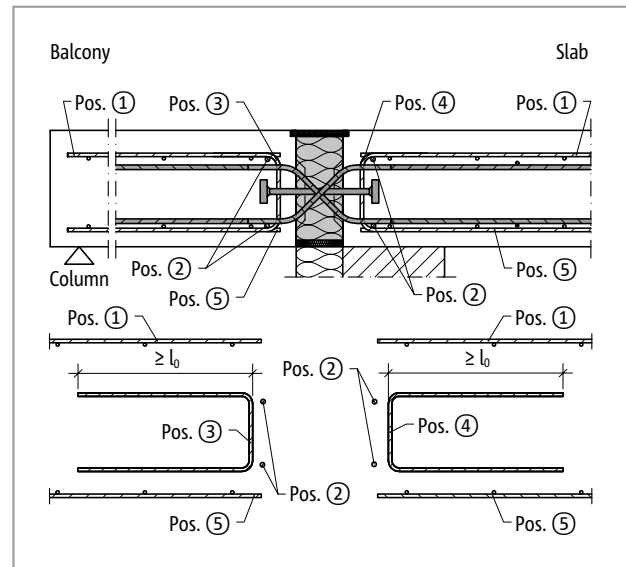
Schöck Isokorb® T type Q-VV: On-site reinforcement
